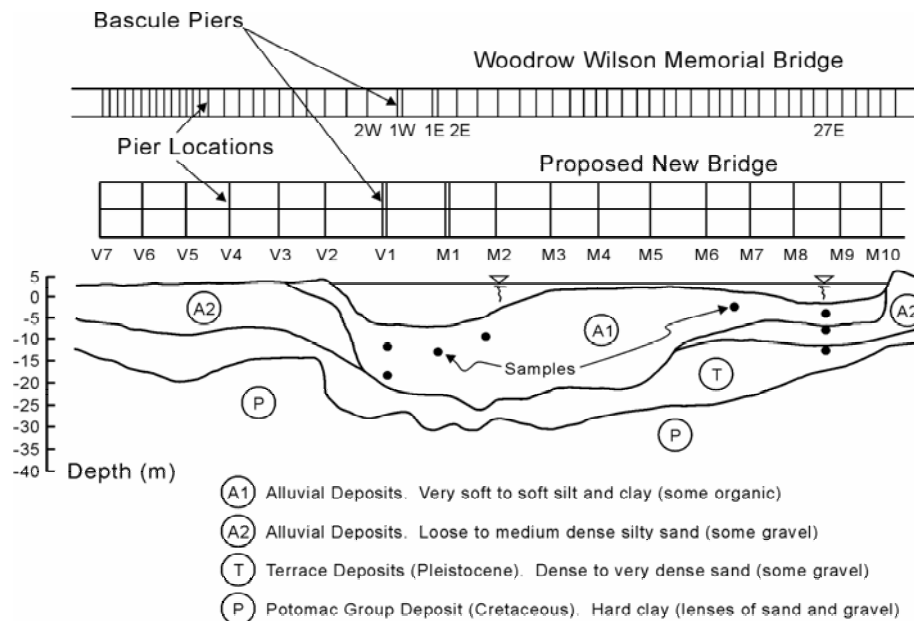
Pier Locations and Soil Stratigraphy Profile for Woodrow Wilson Bridges (after Kwak, 2002)
